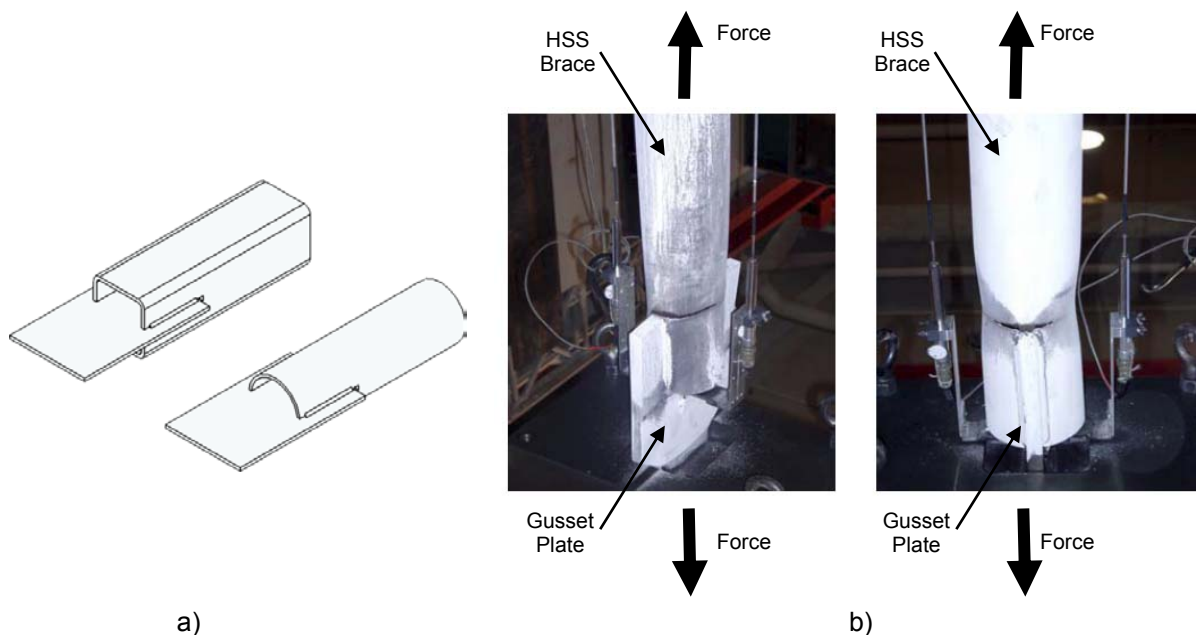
a) Slotted HSS-to-gusset connections; b) Shear lag-induced failure modes for typical slotted HSS-to-gusset connections: gross section fracture (left), net section fracture (right)
